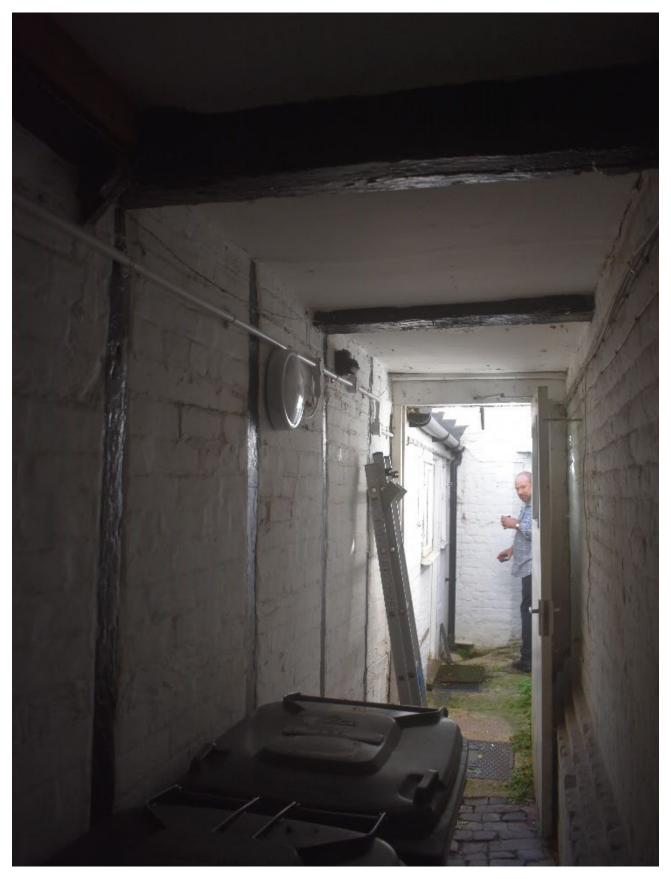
The ground floor timber and brick structure of 59 St Dunstan's Street.
